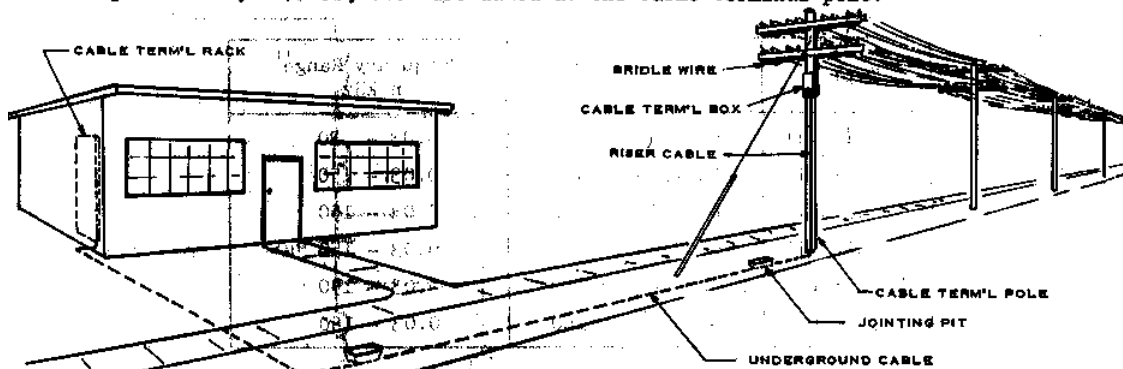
TRUNK ENTRANCE ARRANGEMENTS.
